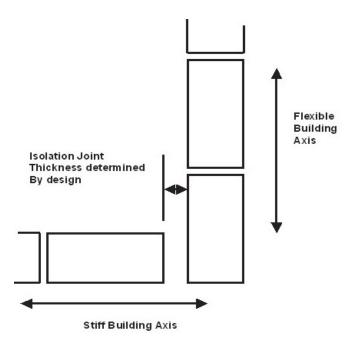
Corner Isolation Joint, Floorto-Floor System Rationally determine design drifts for corner isolation joints.
